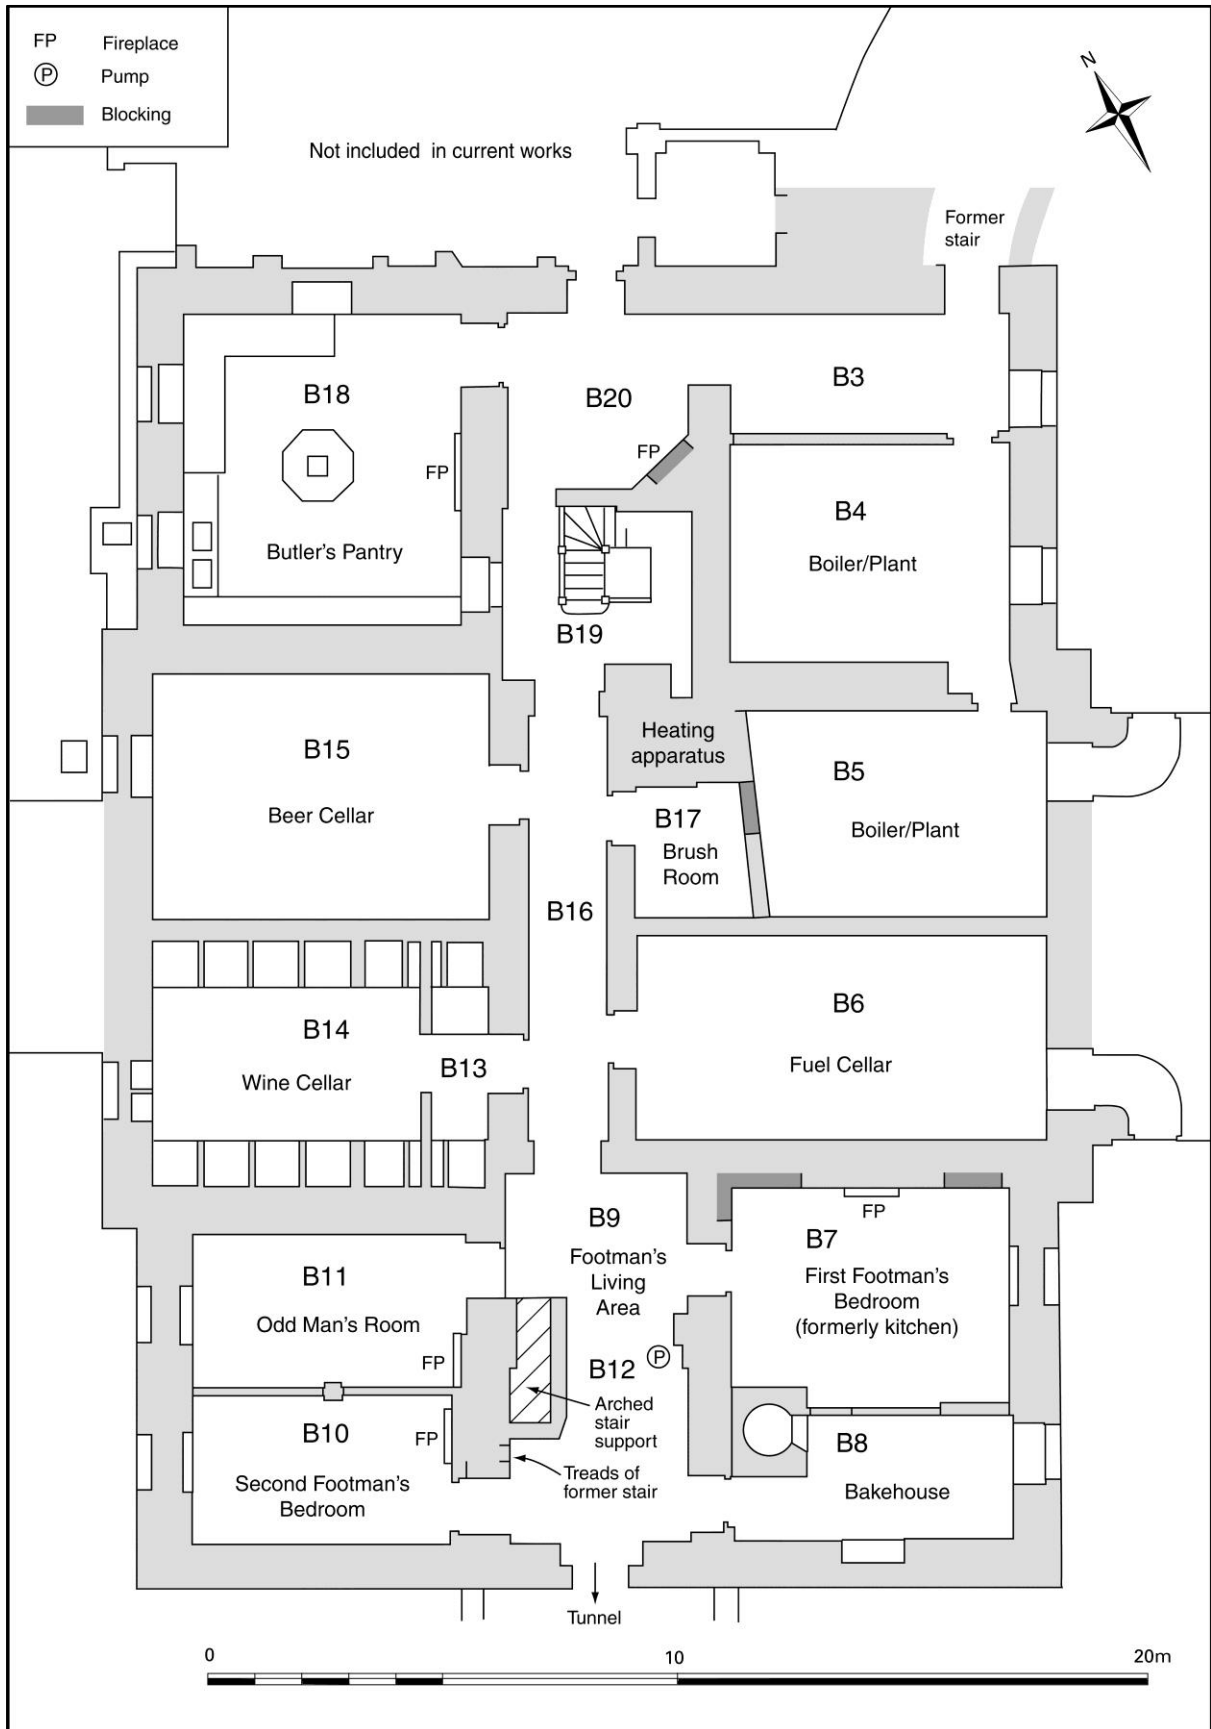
Plan of the basement rooms showing existing layout and new data. Compare Fig 8. Note the North Quadrant Stair at top right (Andy Isham, after Purcell UK)
